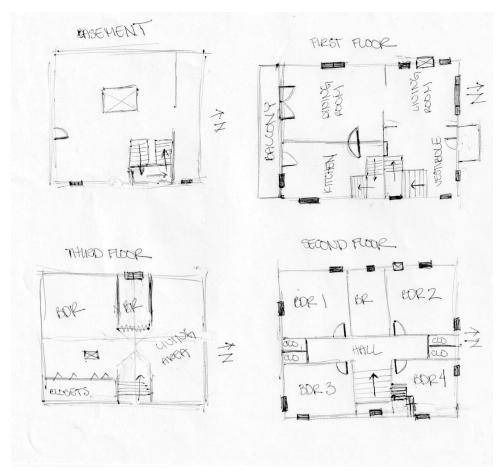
Drawings by Claire Buchinger. Interior Layouts. March 1, 2023. Ithaca, New York.
